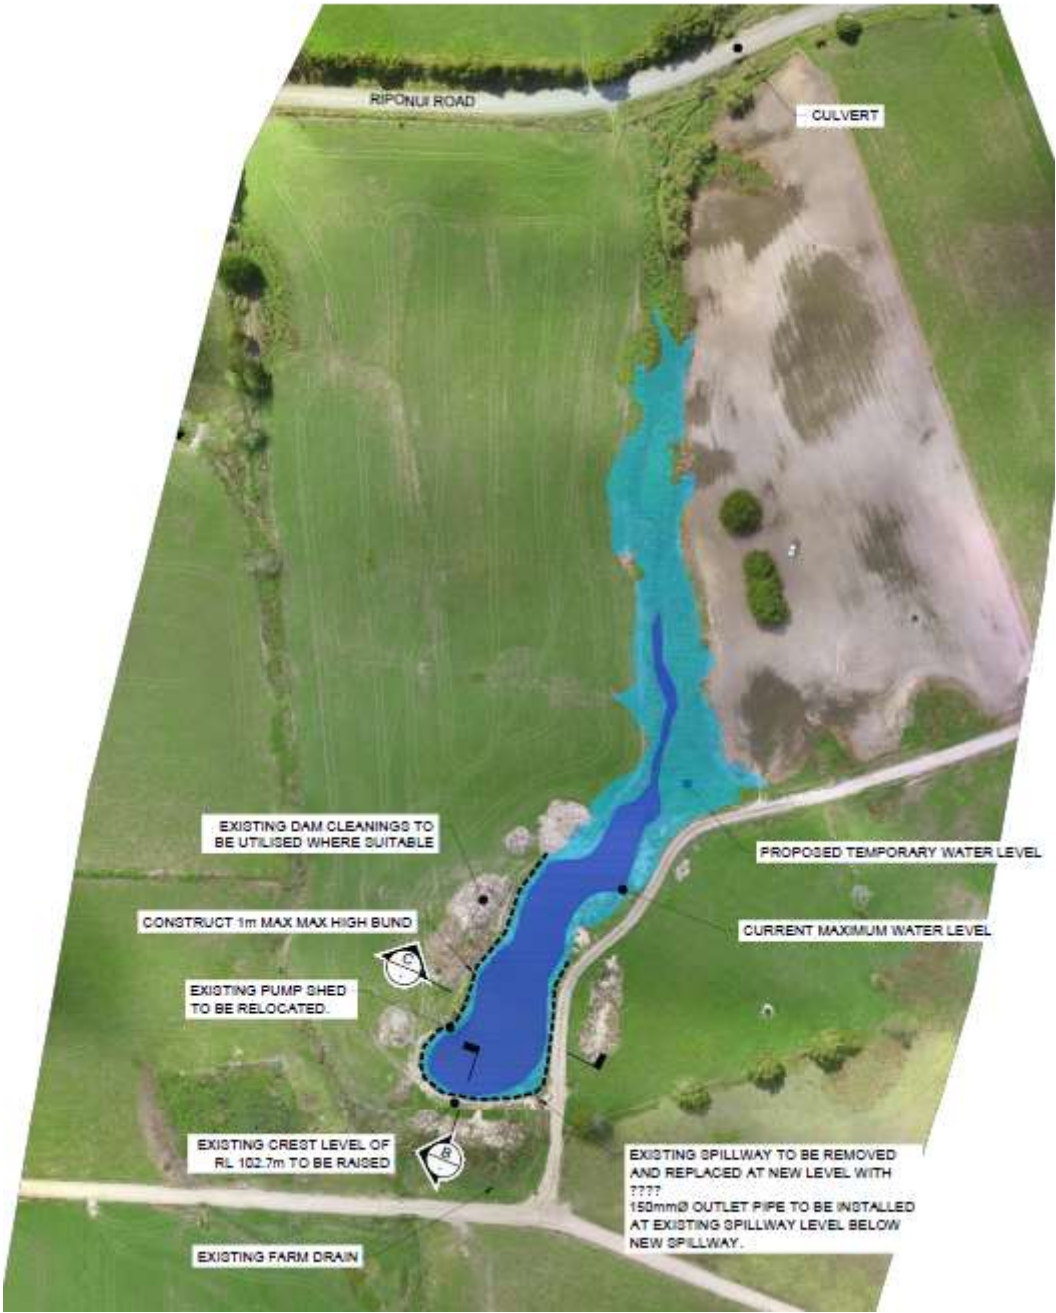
Aerial plan of the Roberts Farm detention dam in Riponui. Source: LWP (2018).
